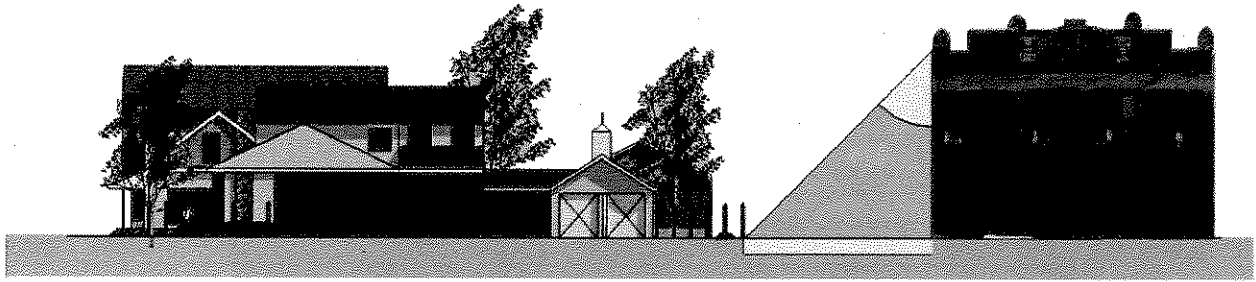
MU-2 BUILDING HEIGHT MINIMUMS
